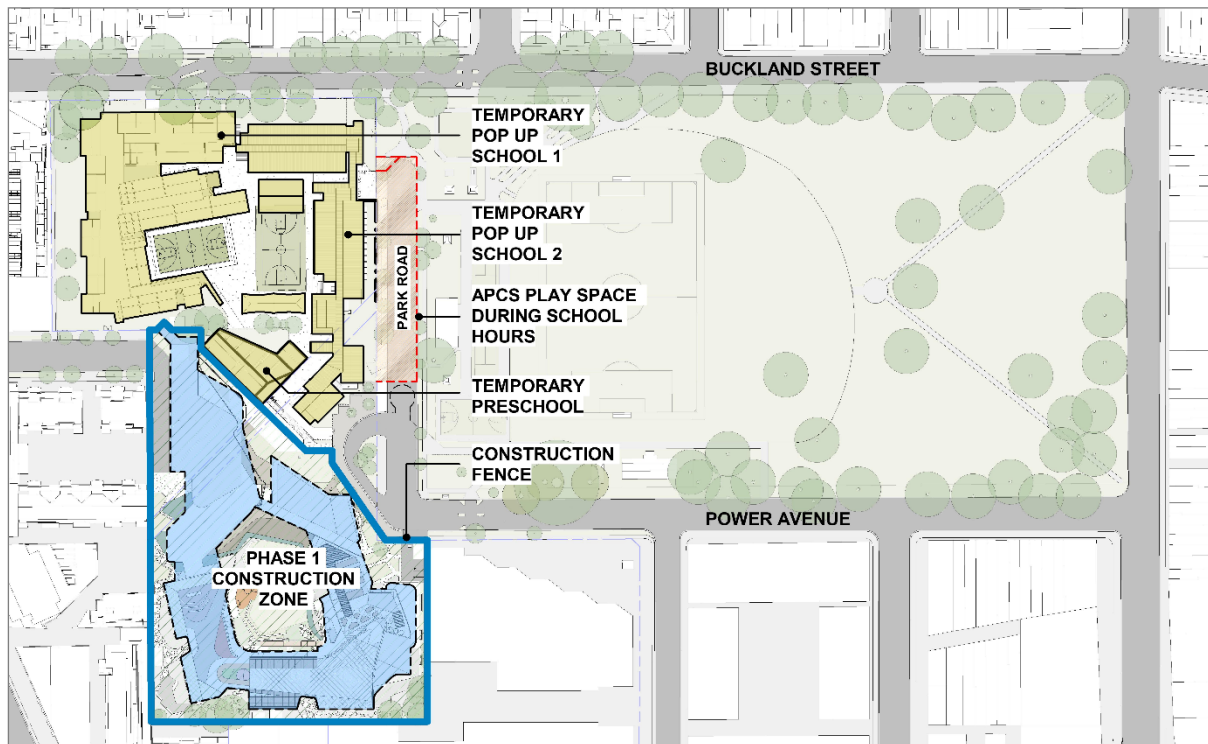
Site plan of Phase 1 showing construction of main works locating pop-up 1, pop-up 2, play space on Park Road, temporary preschool and the construction zone. (Image: Design | TKDArchitects. Source: Department of Education 2018)
